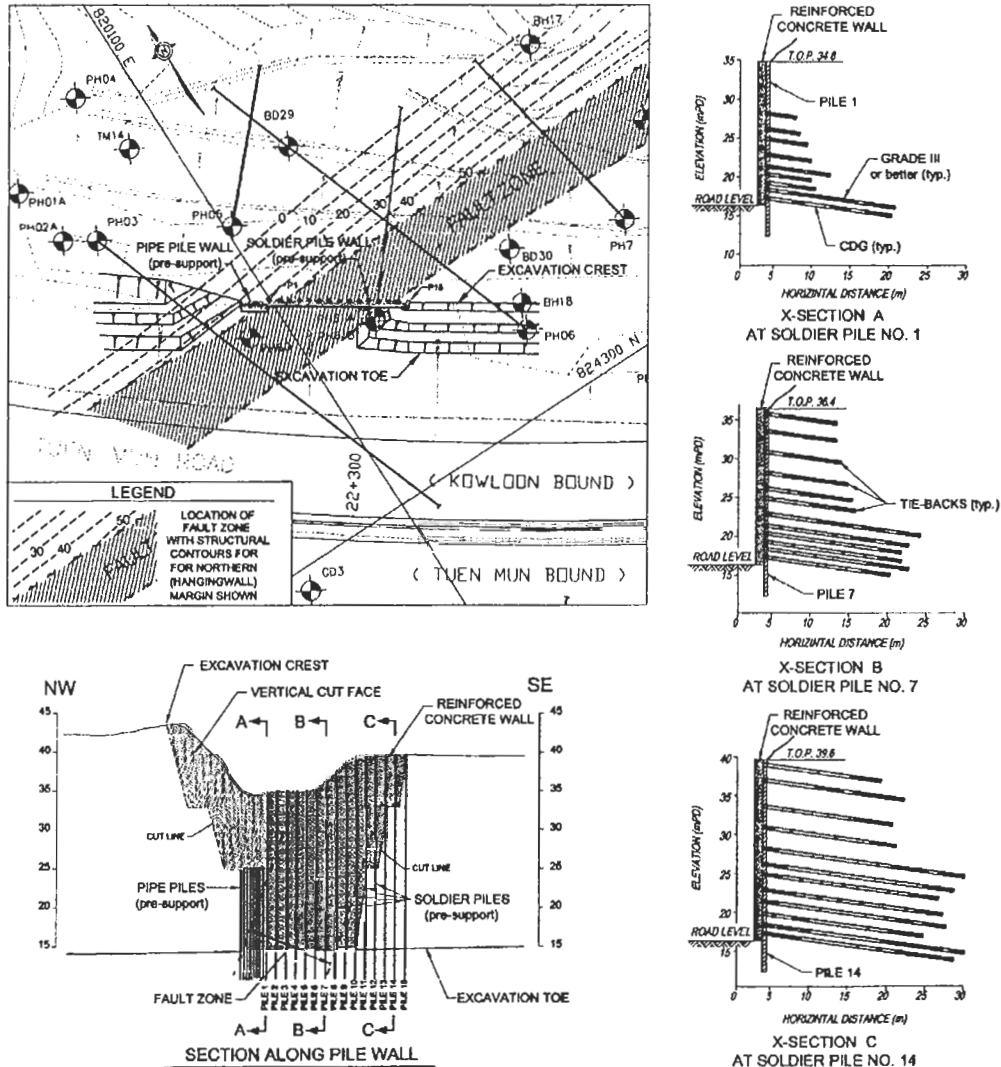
Schematic views of the tied-back retaining wall at TL/S1.
